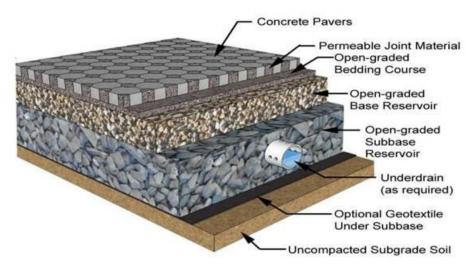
Typical permeable pavement design (Source: Smith, 2009)
